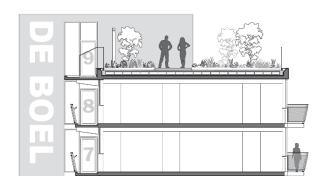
Figure 40 - De Boel Project - Heeswijk Architecten -Amsterdam - Section overview [39.]
